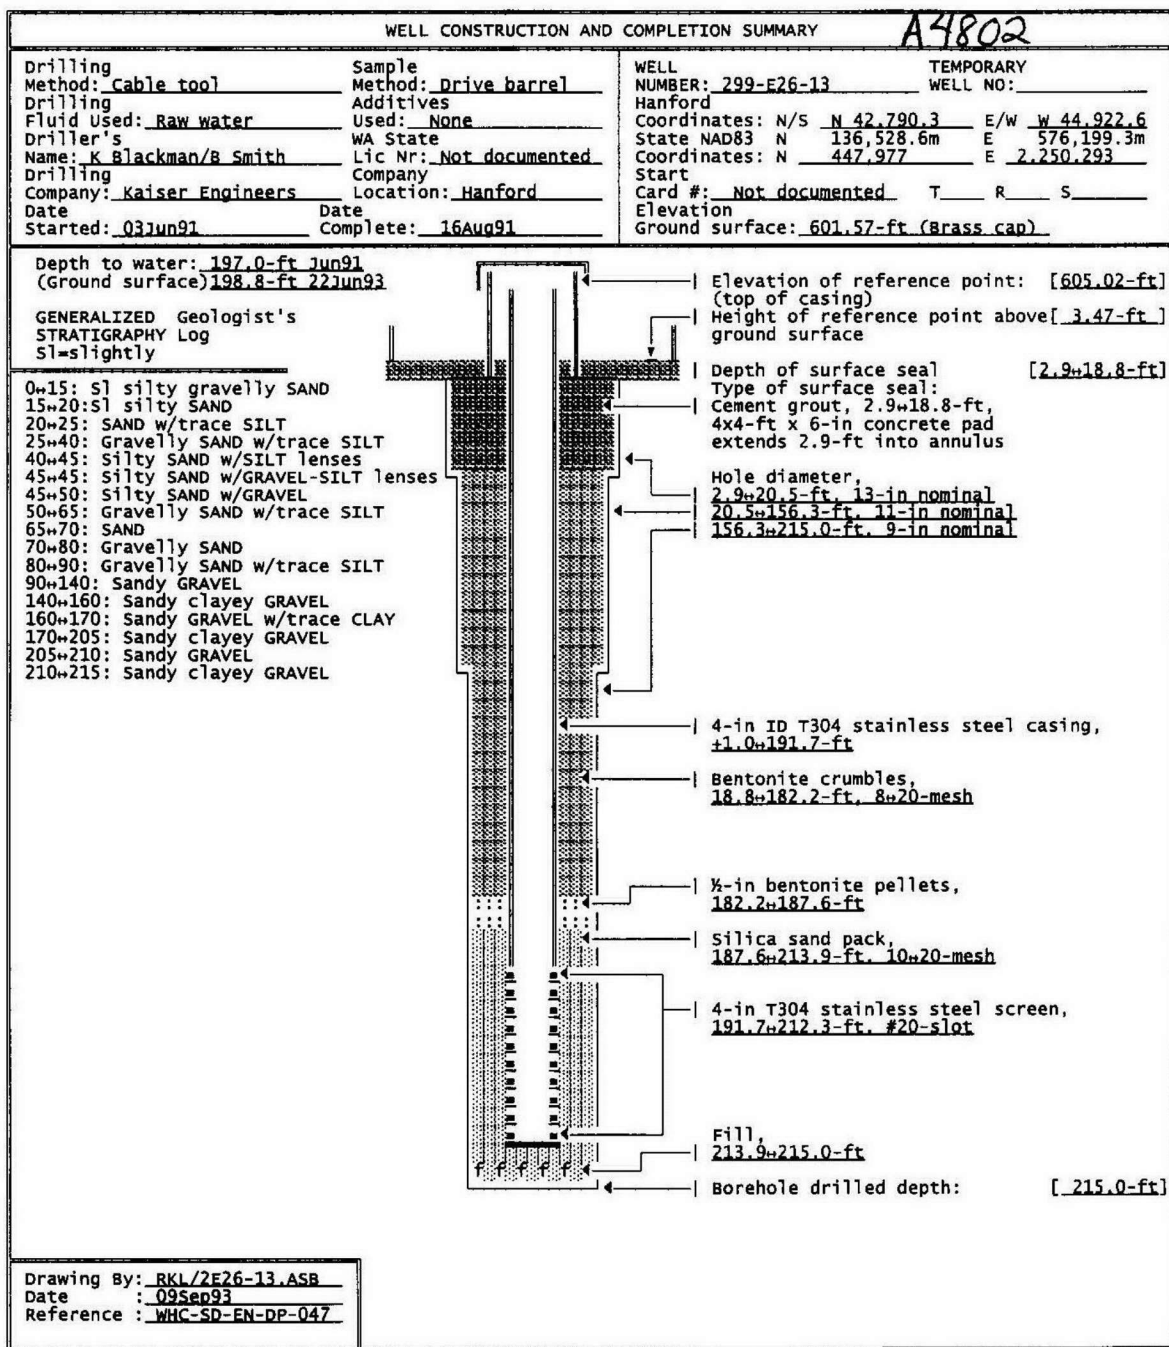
Well 299-E26-13 Construction and Completion Summary
